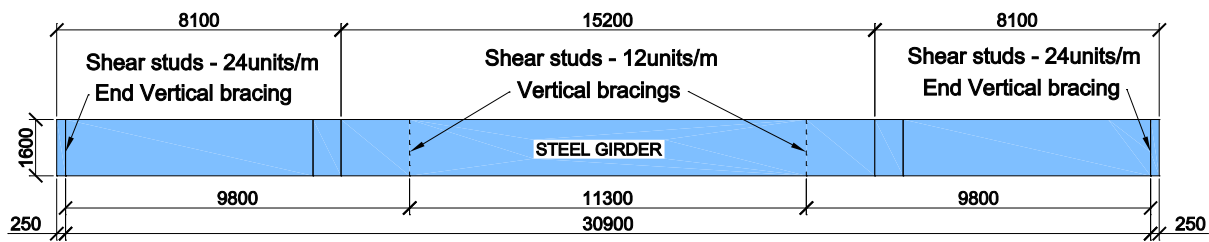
Shear studs' distribution and vertical bracings arrangement.
